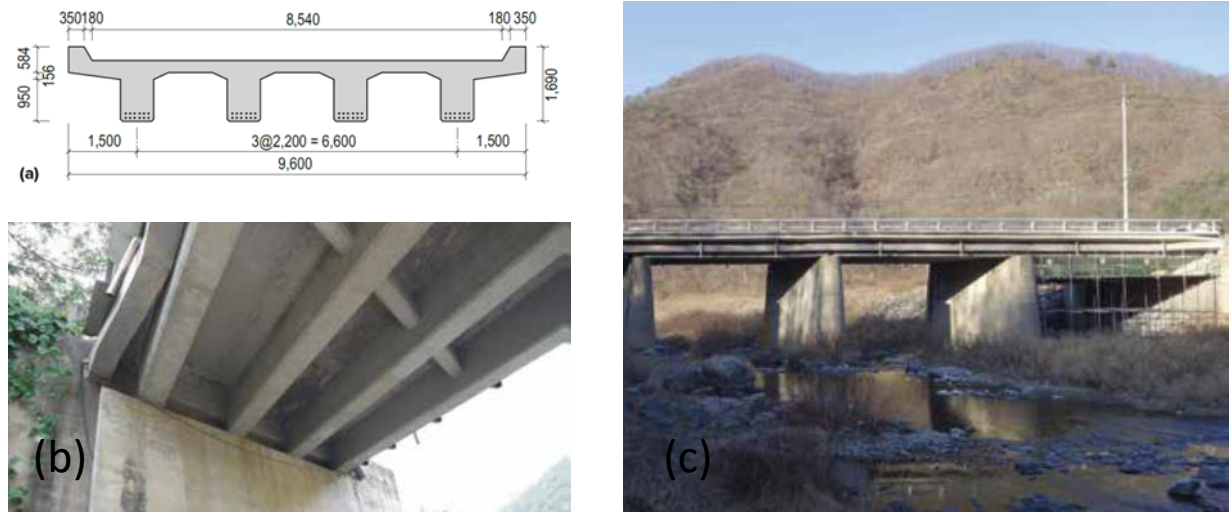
The Buhung Bridge: (a) cross section, with dimensions in mm; (b) view of girders and abutment; and (c) overview, with scaffolding installed in test span (Note: 1 mm = 0.04 in.)
